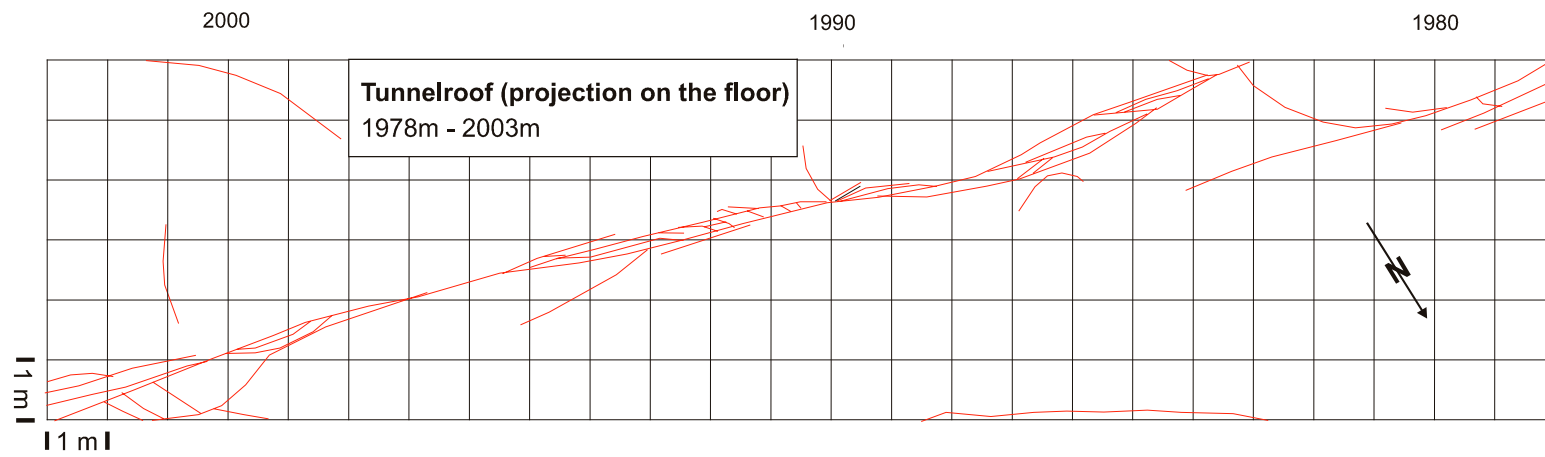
Structural map at Äspö rock laboratory, tunnel metre 1978 – 2003. Projection of tunnel roof onto horizontal section.
